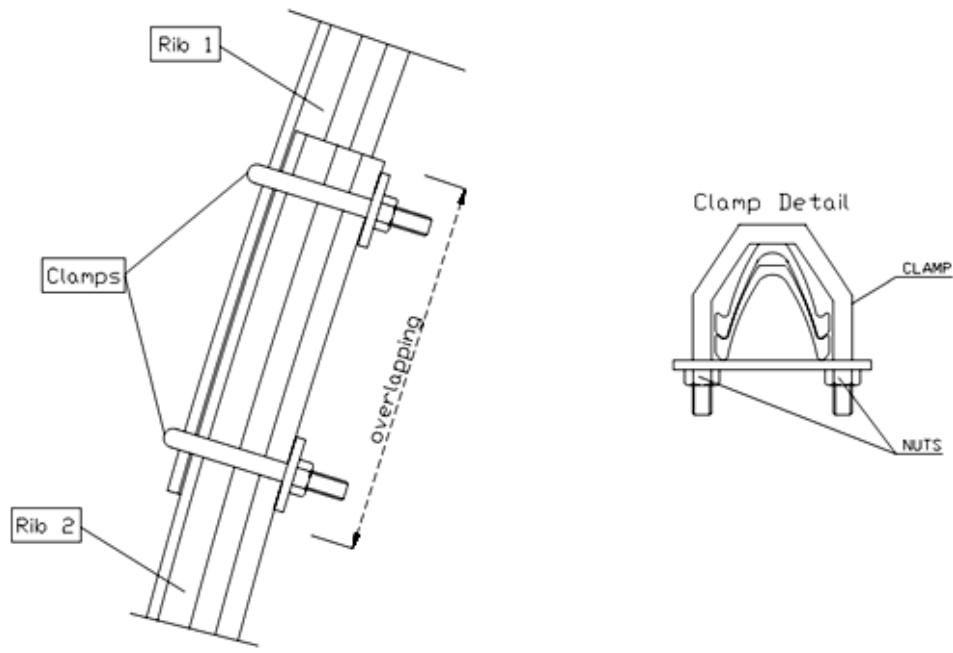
Omega TH 29 Steel Ribs (Technical Drawings, 45.110/15766)
